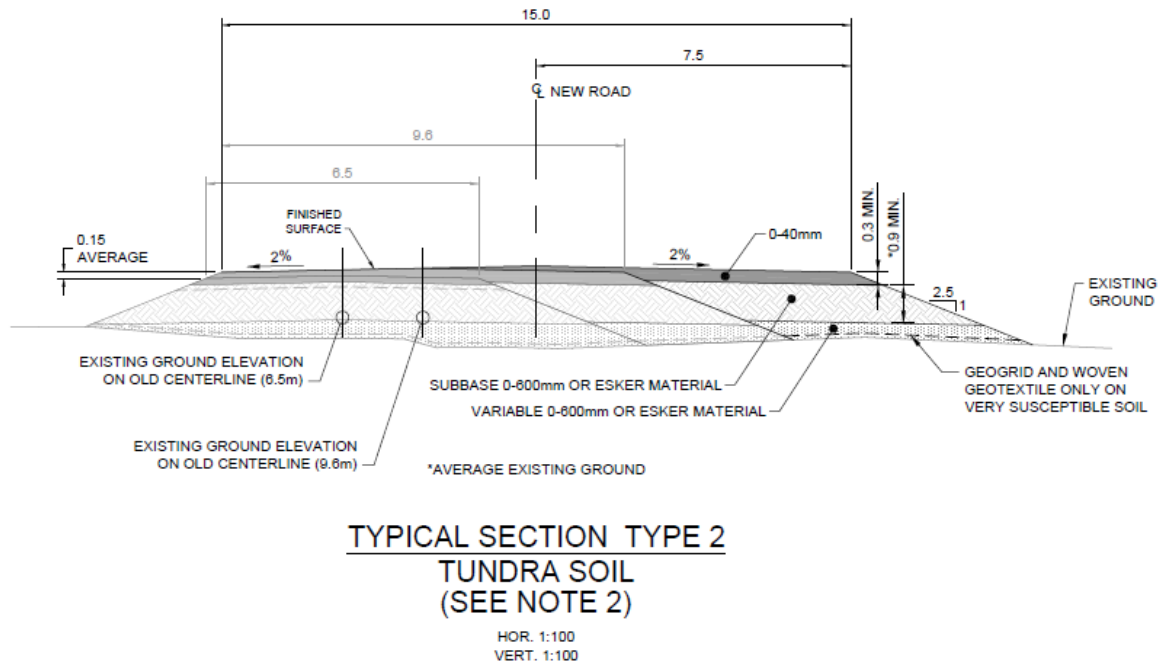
Cross-section of Haul road built over thaw susceptible soil
